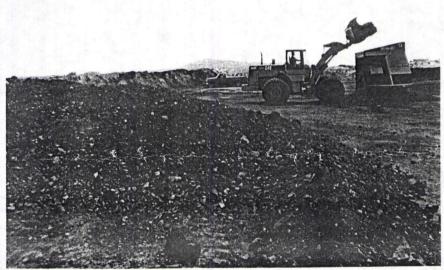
Berm. The west apron of the asphalt facility has been bermed. Asphalt mixing/manufacturing can be seen on the right side of the picture.
